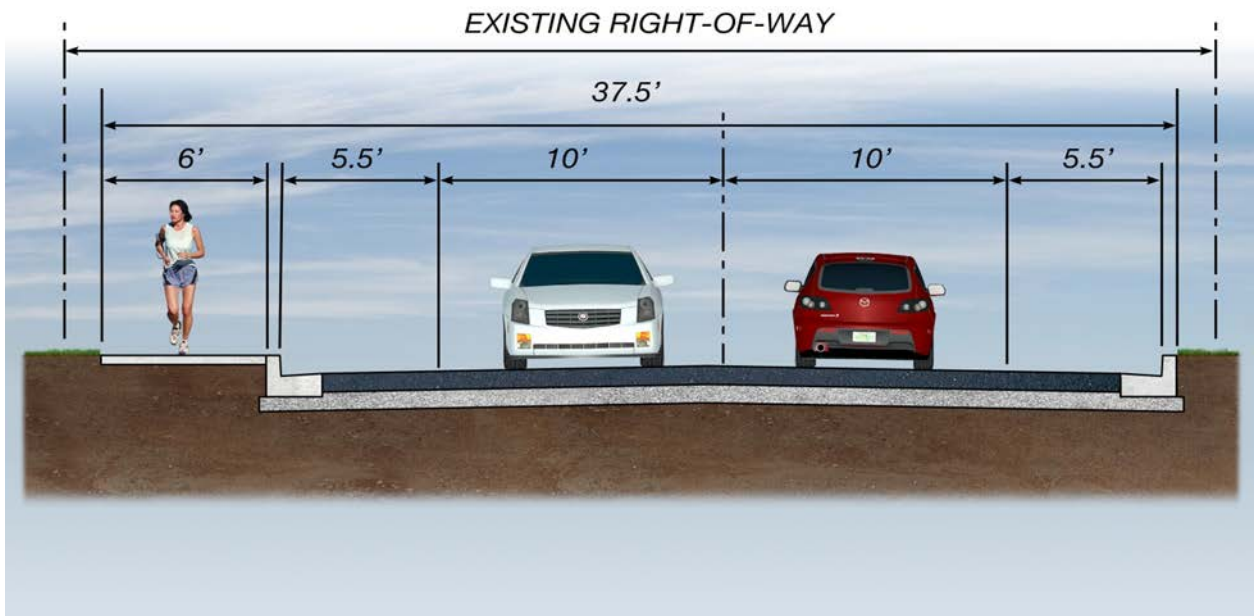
Proposed Roadway Section West of Proposed Movable Bridge
